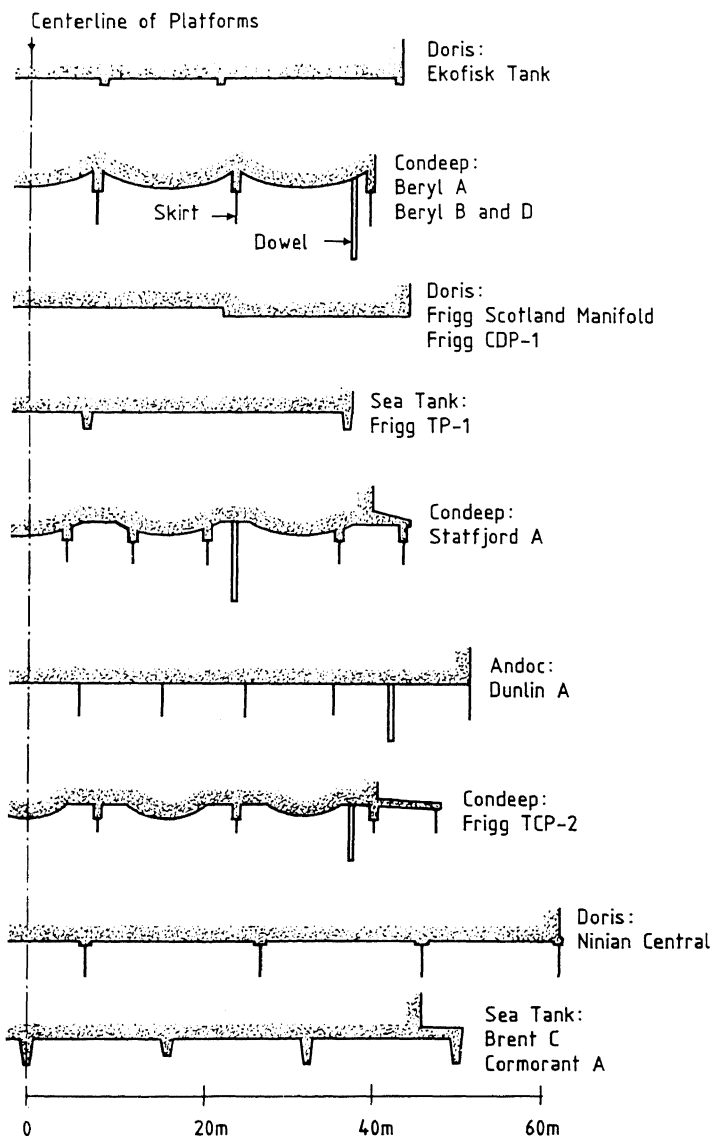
Cross-section through caisson bases of different concrete gravity structures.
